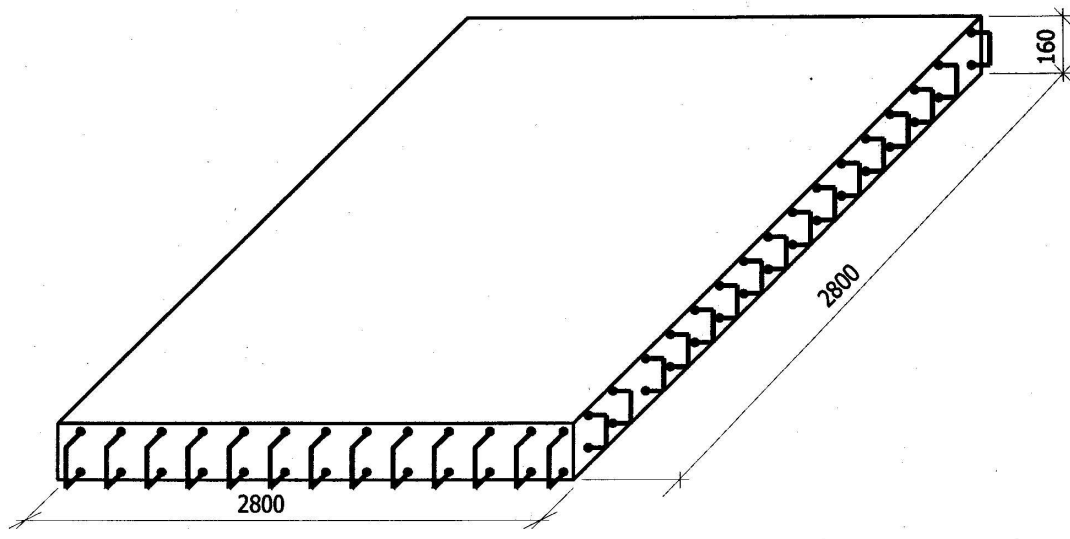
B: Precast reinforced concrete slabs; a slab to be joined with a column is perforated with a hole at the center.
